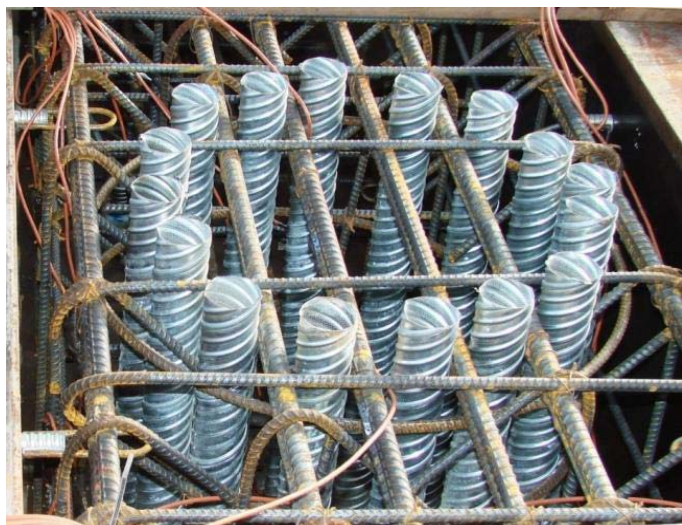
Grouted duct cap construction and cap placement (Matsumoto 2009b).
